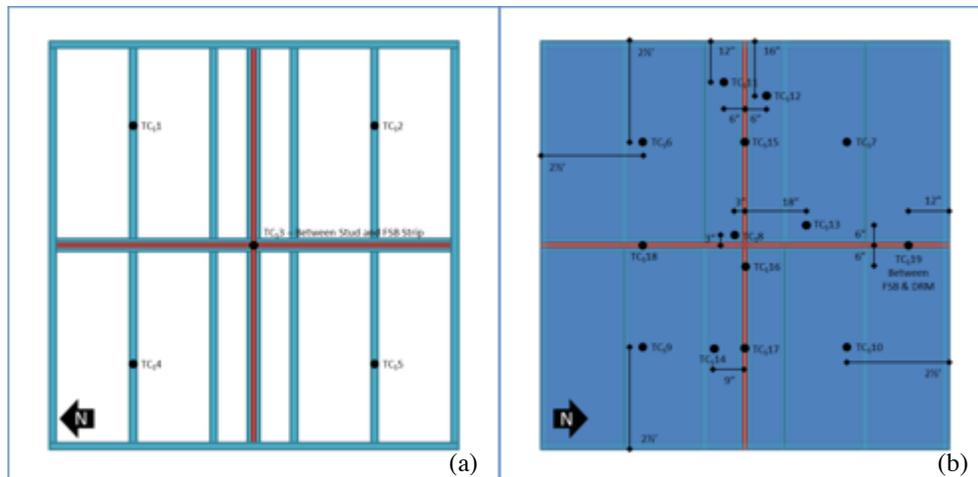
Sample thermocouple locations on assembly showing (a) finish TC_s and (b) unexposed TC_s.
